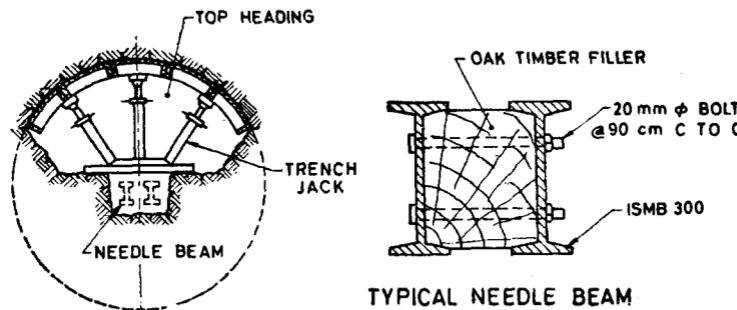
NEEDLE-BEAM METHOD OF TUNNELLING WITH STEEL LINER PLATES
